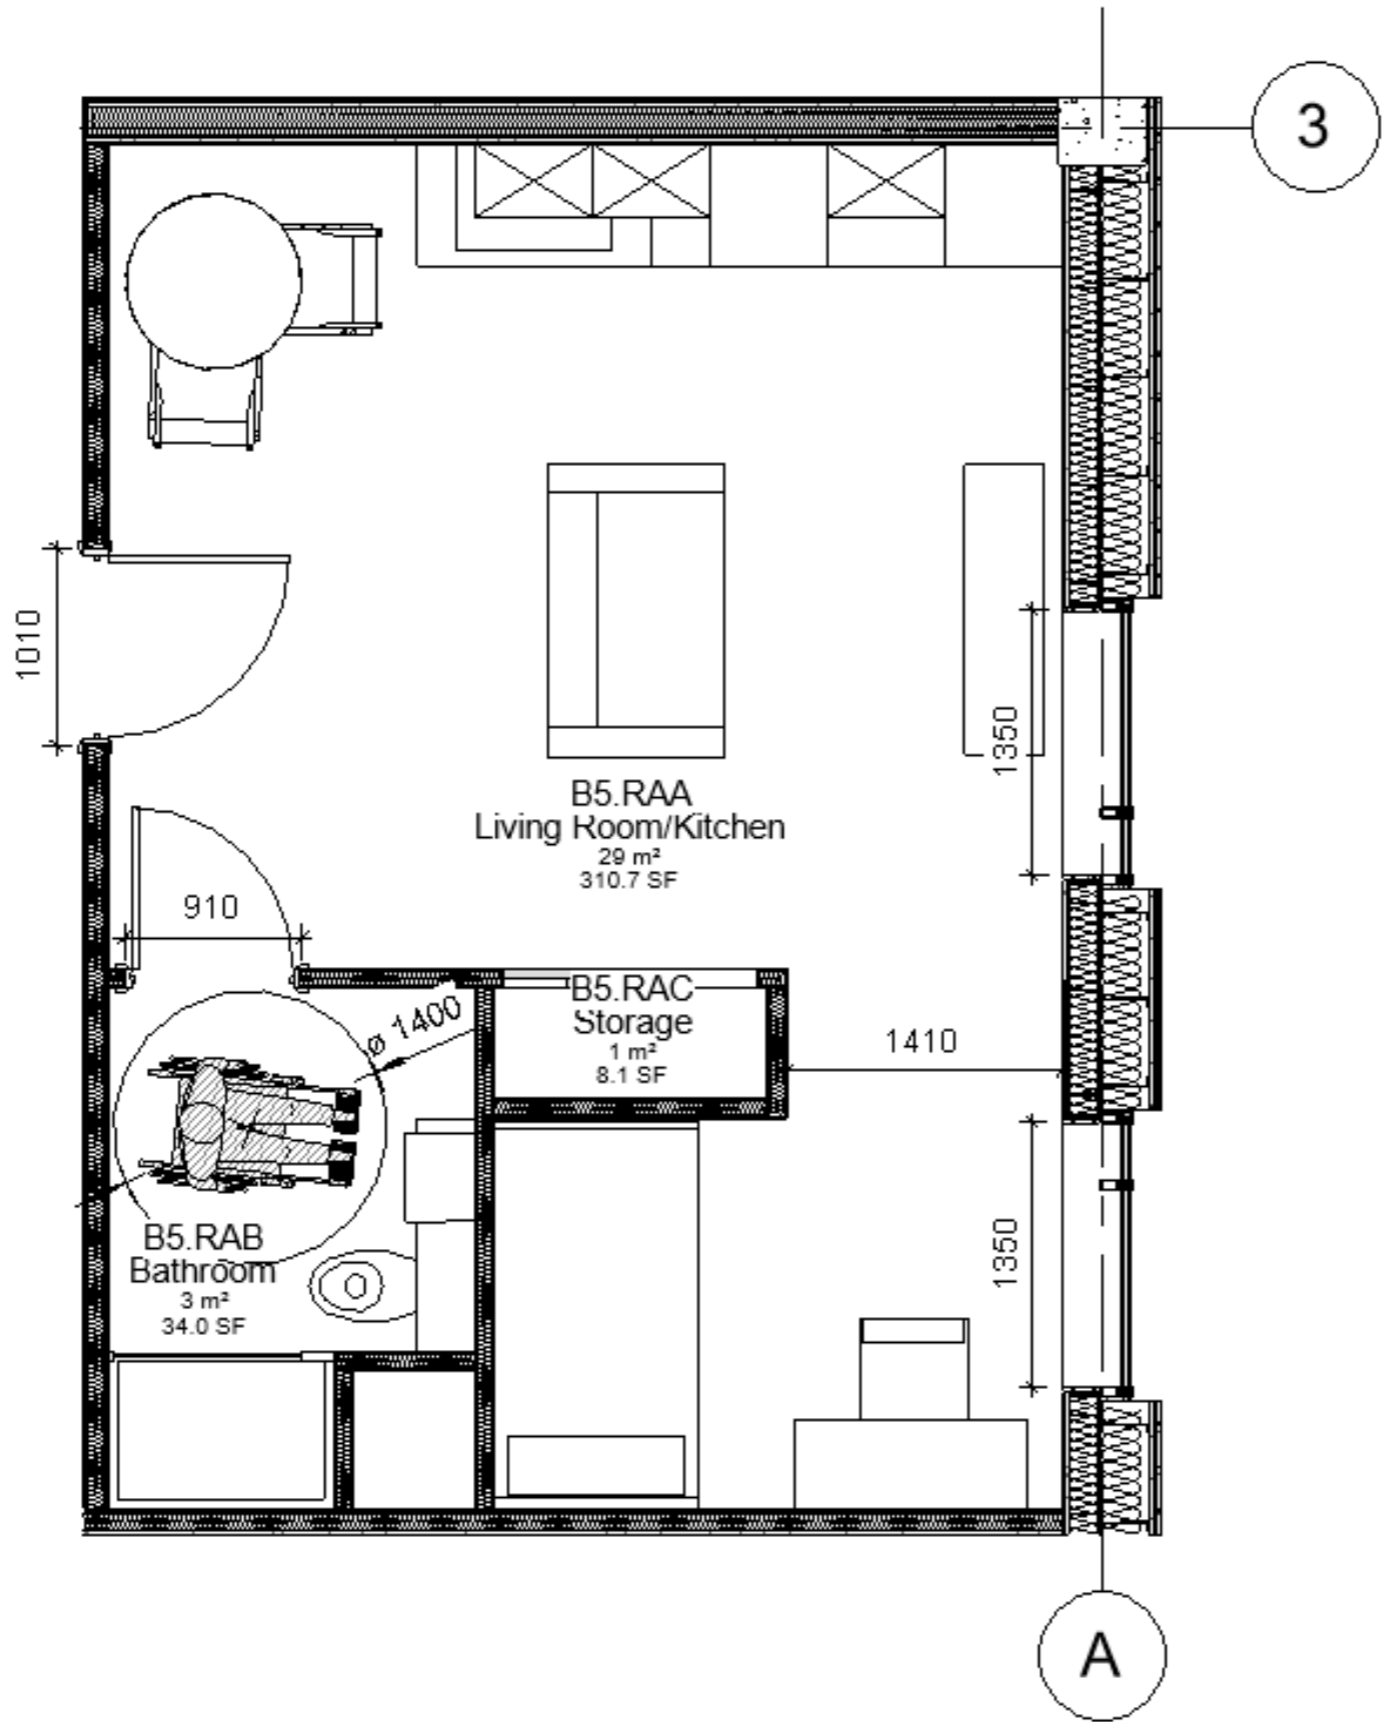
Enlarged Young-Old Apartment Section (Author, 2021)
